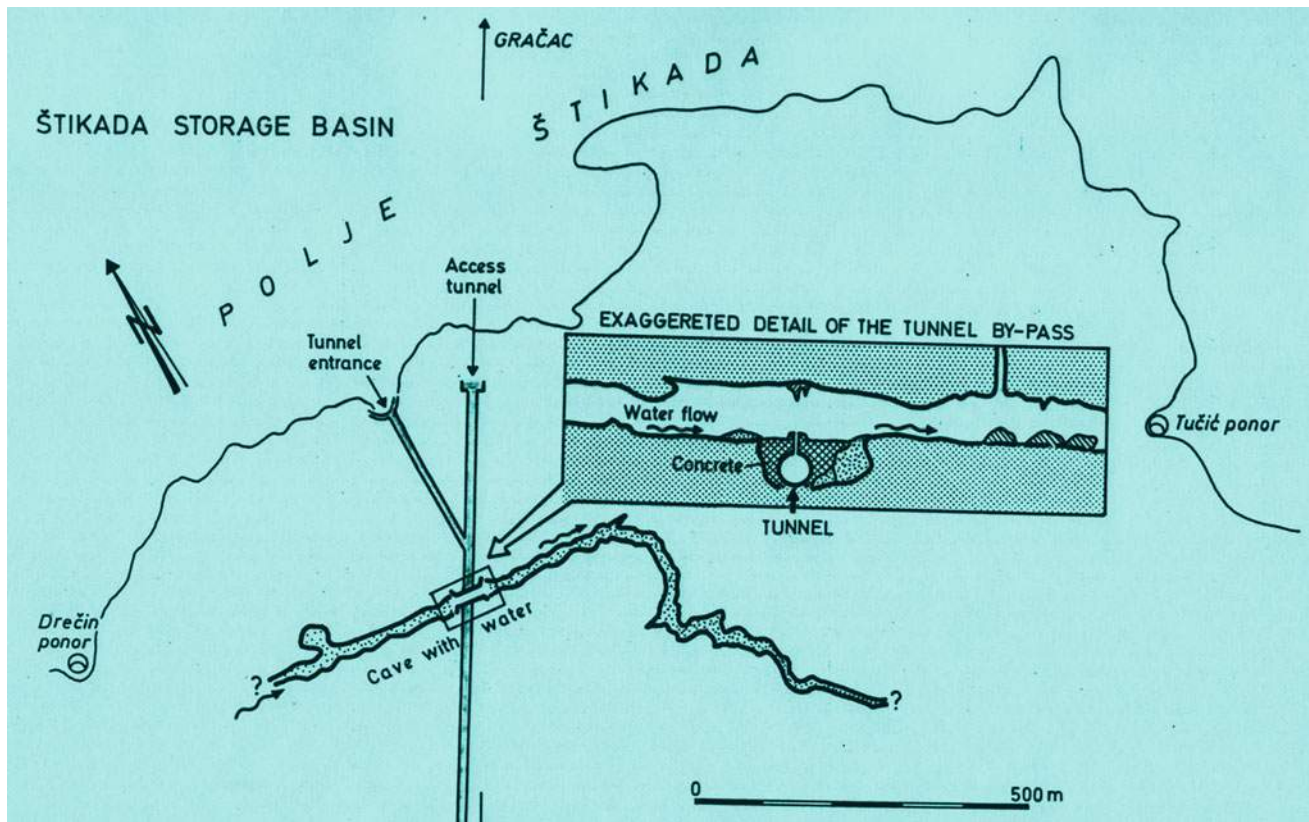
Profile and plan of a cavern near the north entrance of Velebit Tunnel
